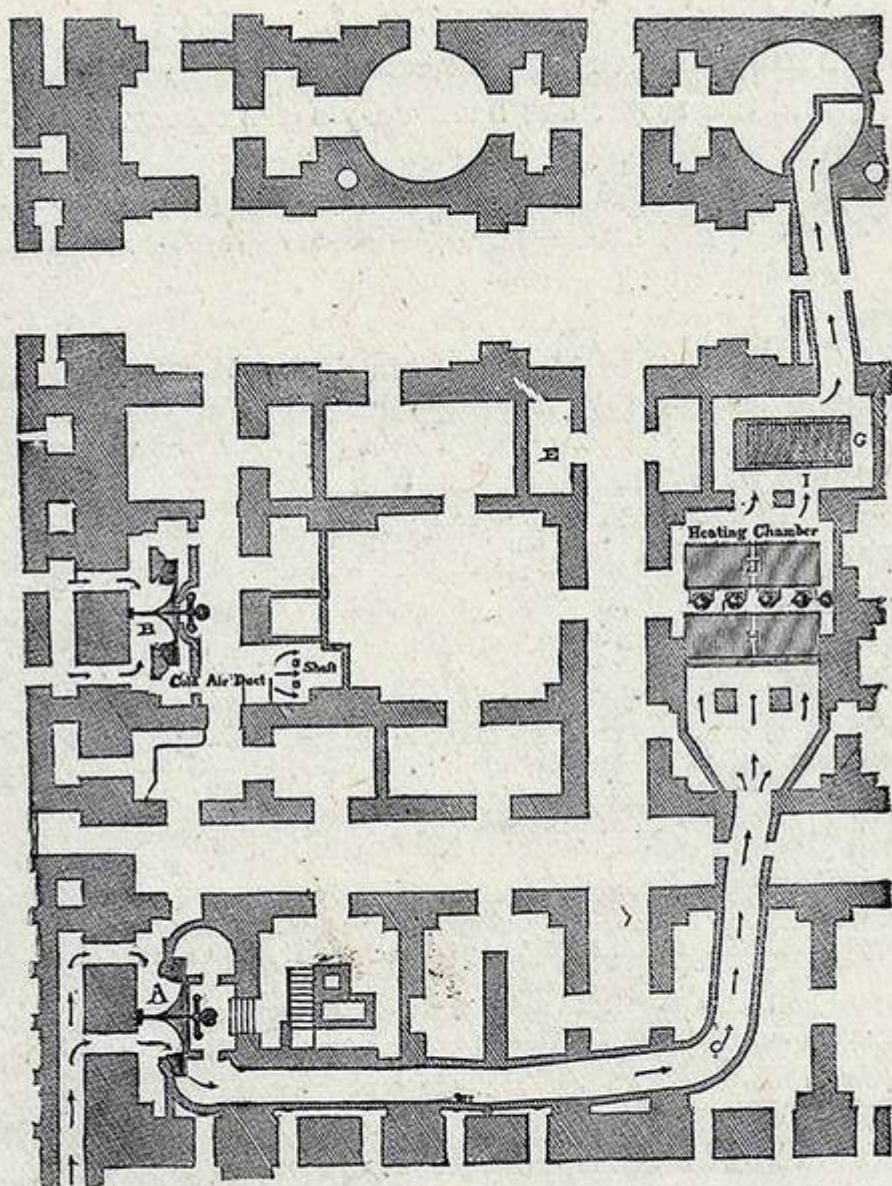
PLAN SHOWING AIR DUCTS, ETC., IN CONNECTION WITH HEATING APPARATUS, SOUTH WING, U. S. CAPITOL.
